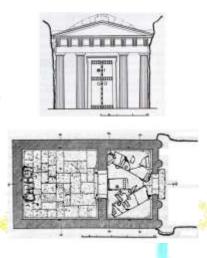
Plan and front façade designs, Macedonian tomb D. [6]
